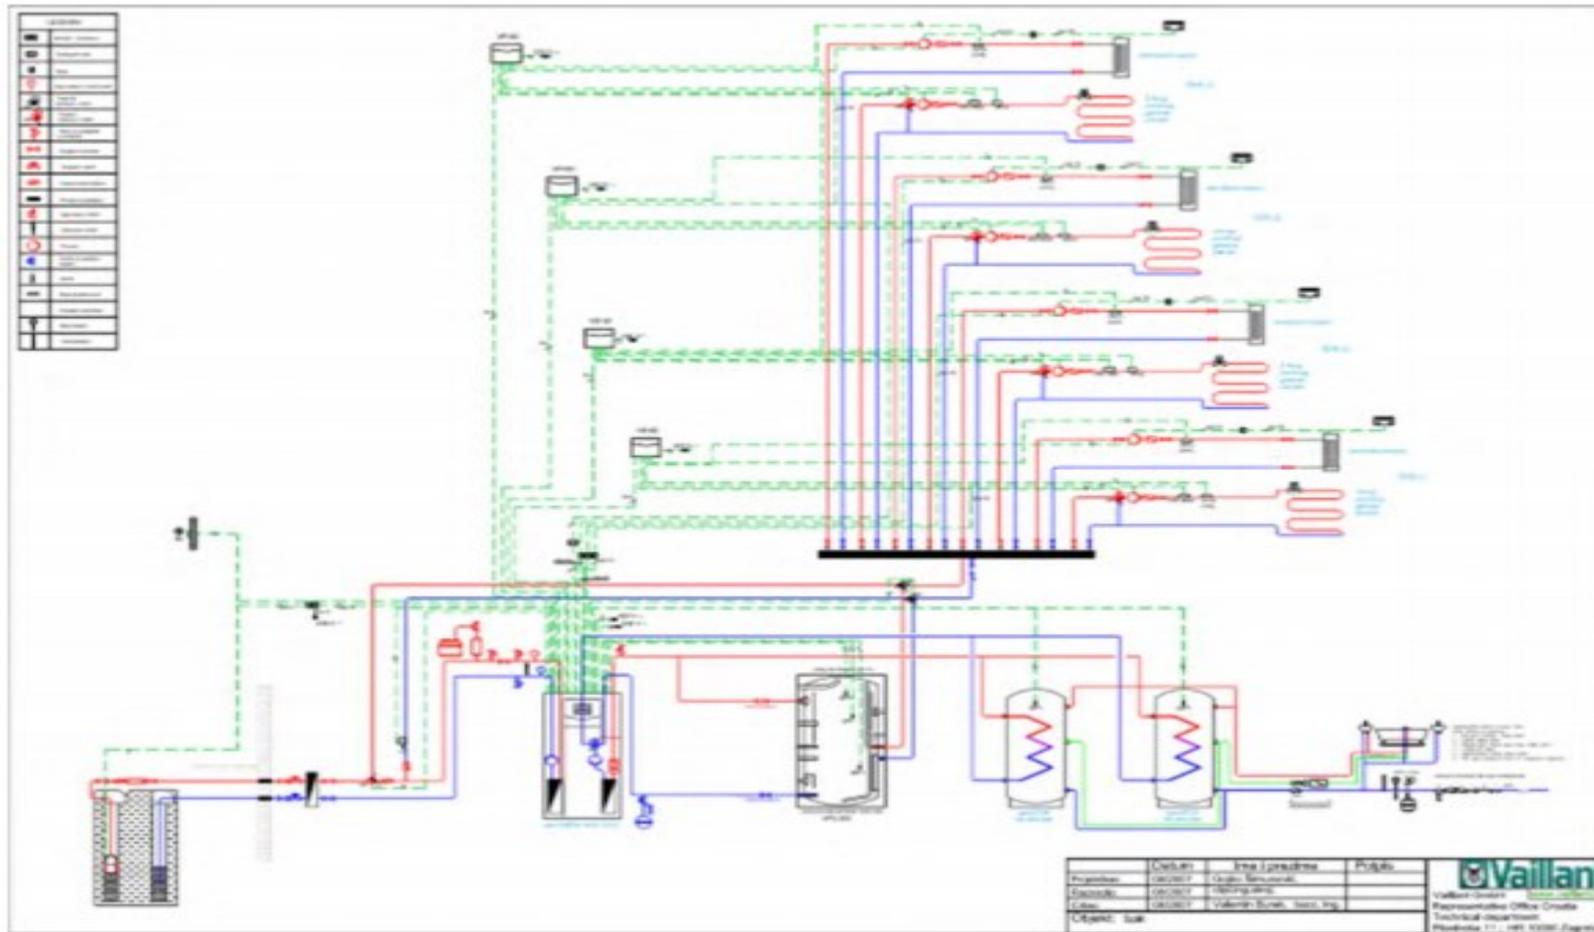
Schematic depiction of the applied heat pump system for the apartment building
